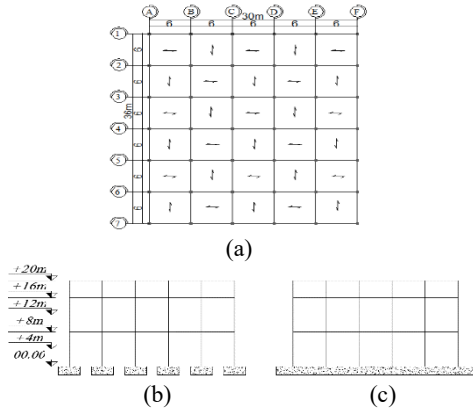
(a) Plan, (b) sections of building with footing and (c) strip foundations
